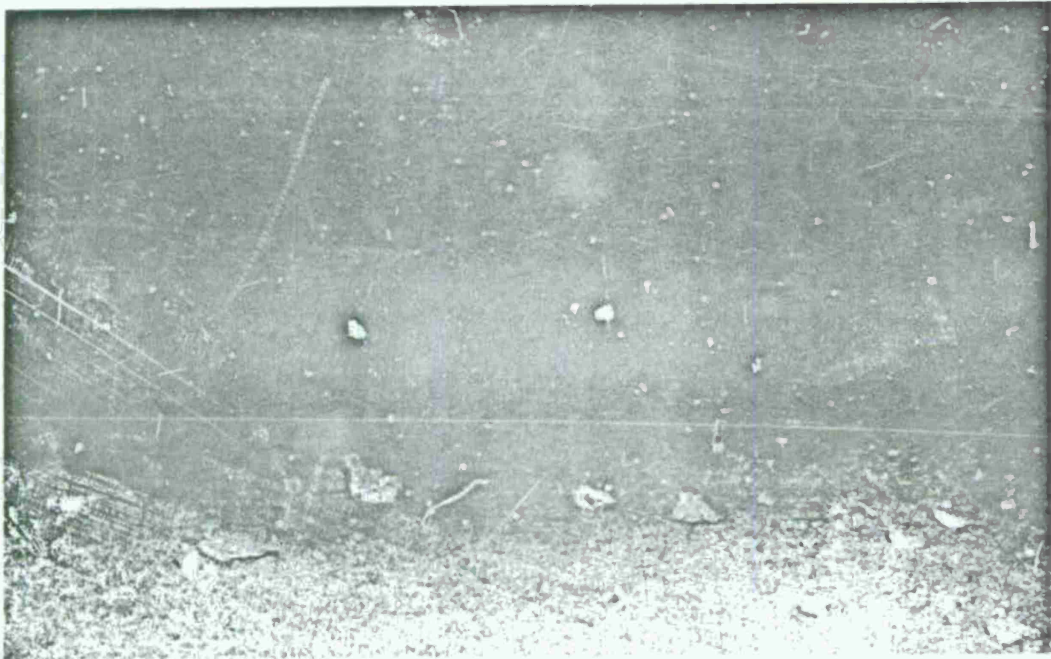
Steel Sheet From Inside Face of Igloo B Door.
